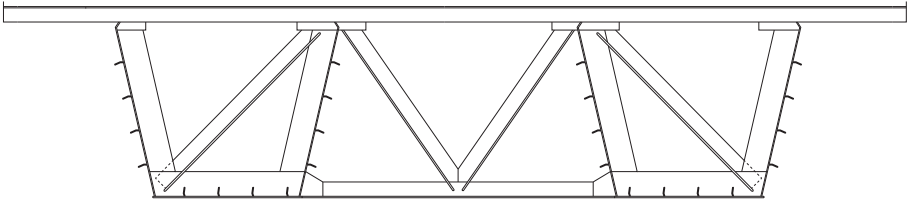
Section through an extruded aluminium section (scale 1:5) used to form the deck of extruded aluminium bridge deck system: typical bridge deck part long section
